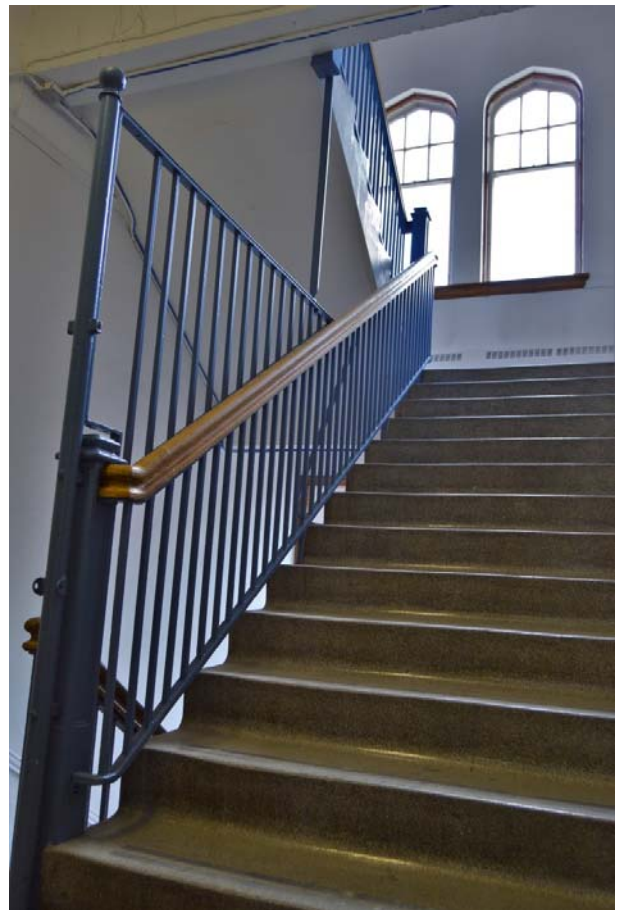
West staircase, rising up to landing illuminated by stairwell windows identical to those on the east
